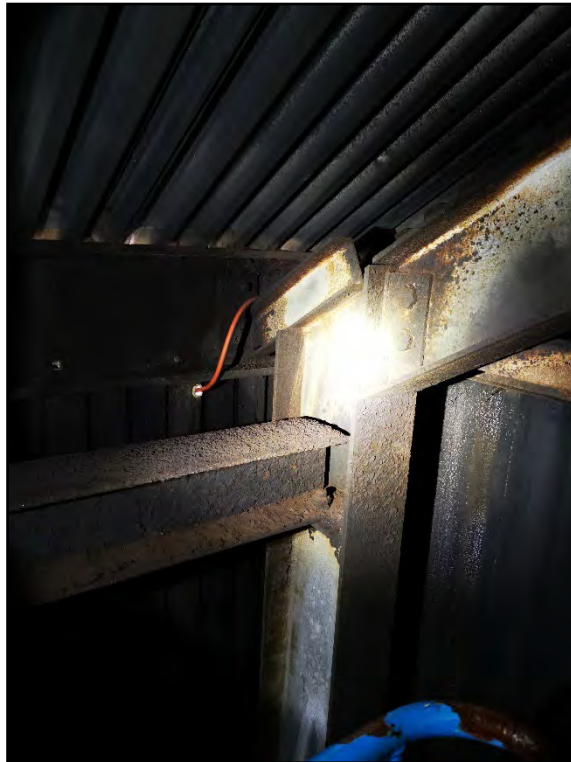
Damage Due to Impact and Corrosion of Steel Members
